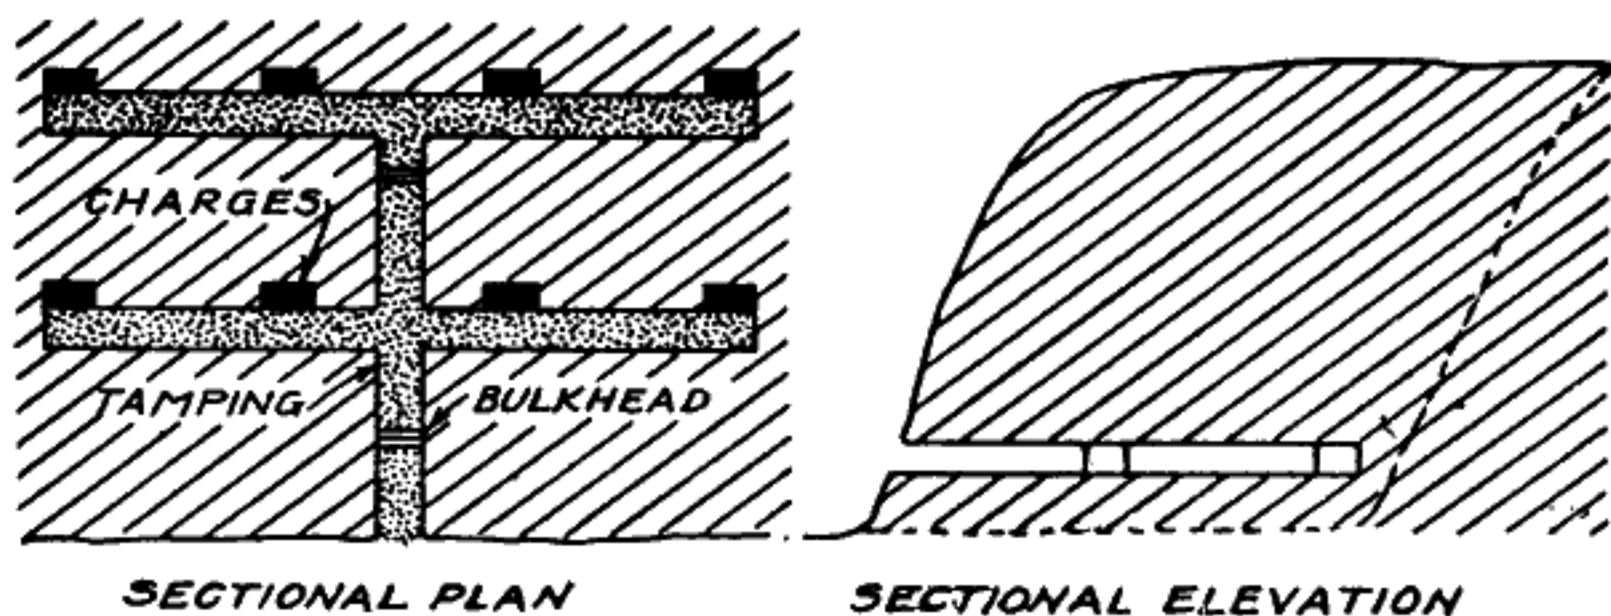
Showing the plan and elevation of a tunnel blast. The dotted line shows approximate line of breaking. See Fig. 91, page 75, for method of wiring.
